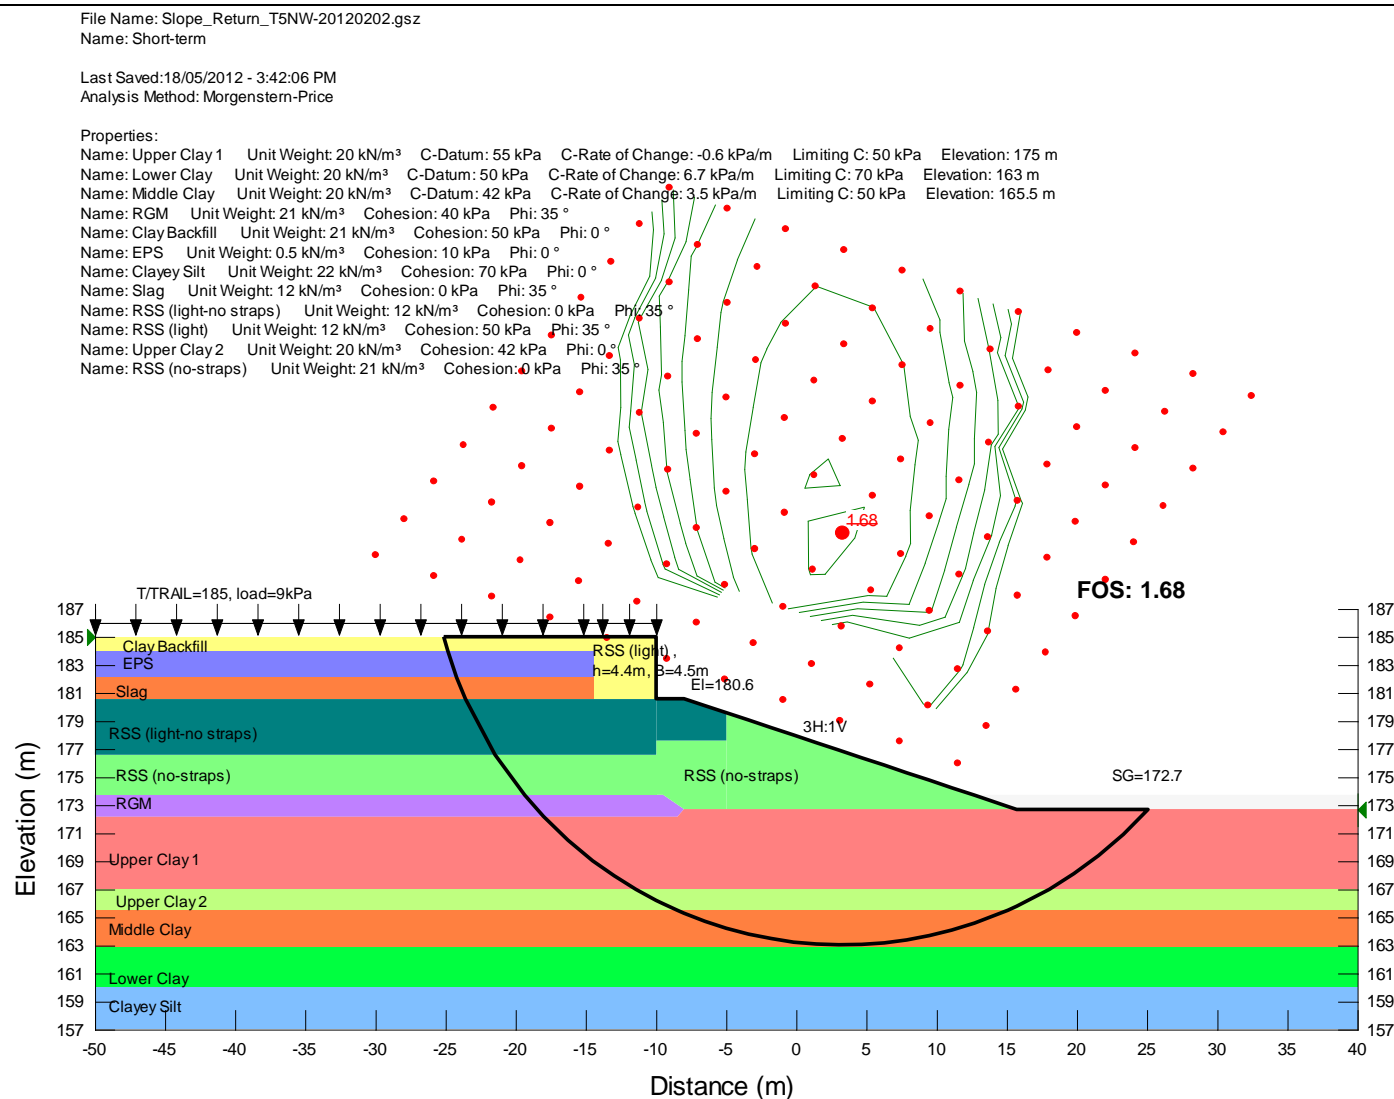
Slope Stability Result – North Abutment Return Wall – Short-term (Undrained) Loading
